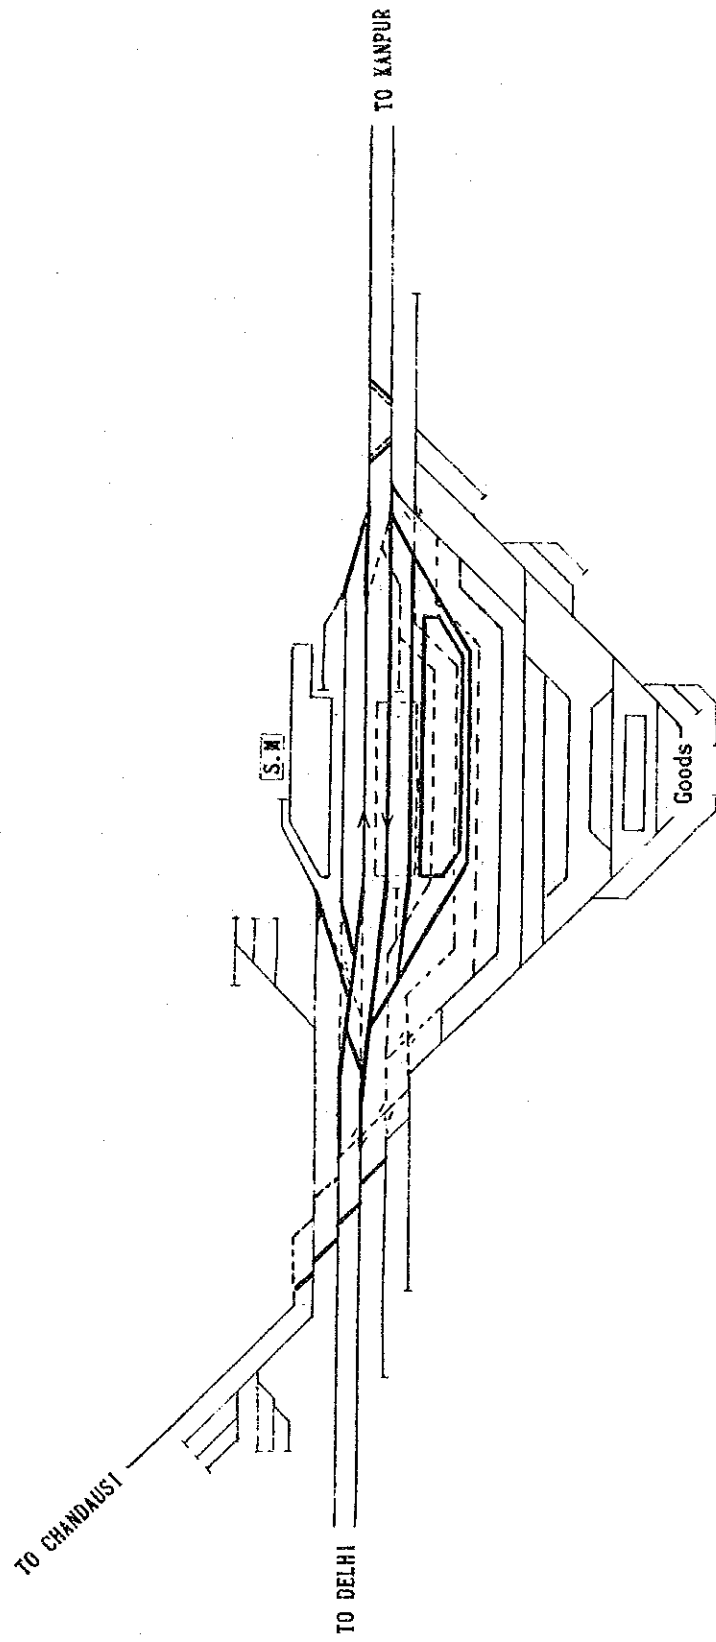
Aligarh Station Yard Improvement Plan
